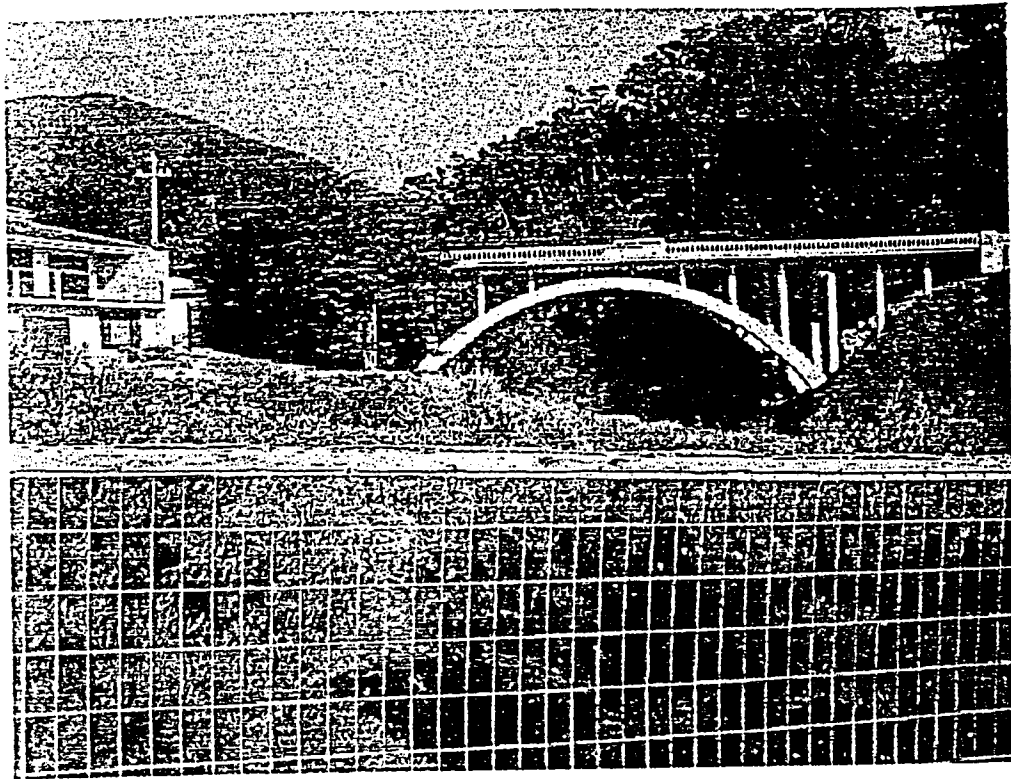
Photo of Highway One Bridge looking across Parcel APN 243-161-017 and 243-161-018.
